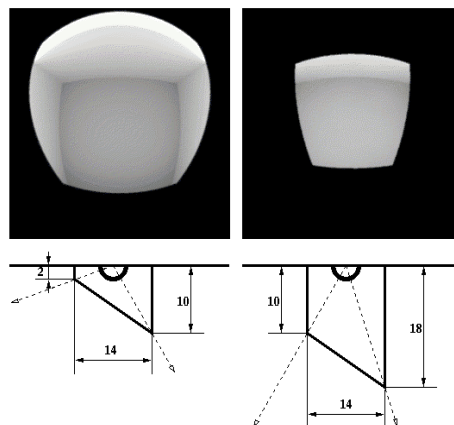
Partially and fully shading photocell geometry (top figure shows sensor's view from ceiling towards floor and walls).
